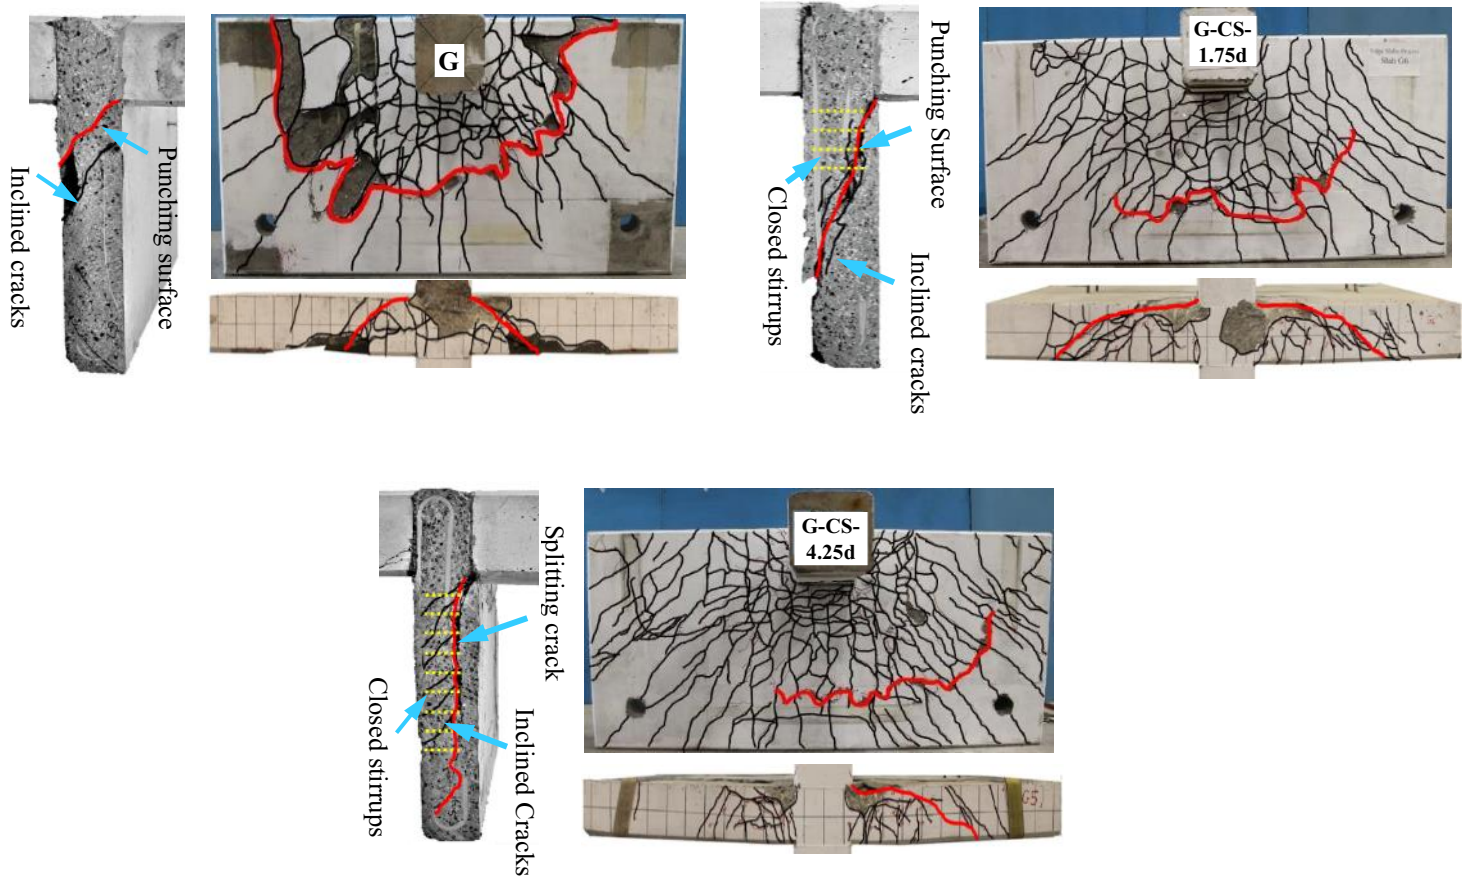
Final punching-shear failure surface (in bold) on slab tension side and free edge and saw-cut section
